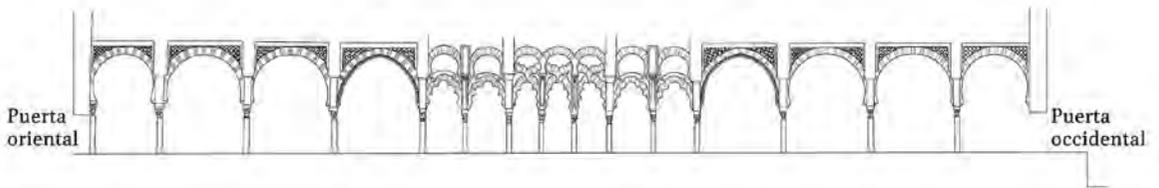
Elevation of the transverse arcade along the qibla wall
